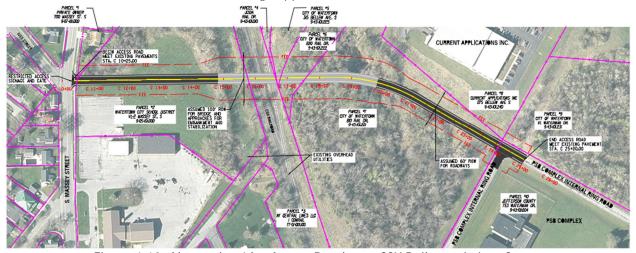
Alternative 6A – Access Road over CSX Railway via Ives Street
